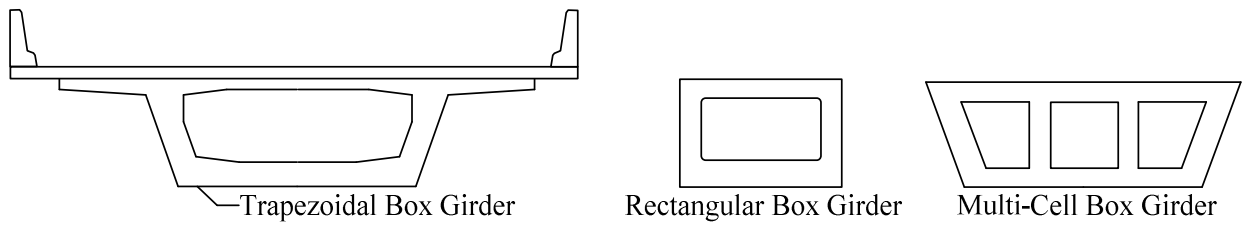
PS CONCRETE TRAPEZOIDAL/RECTANGULAR/MULTI-CELL BOX GIRDER
